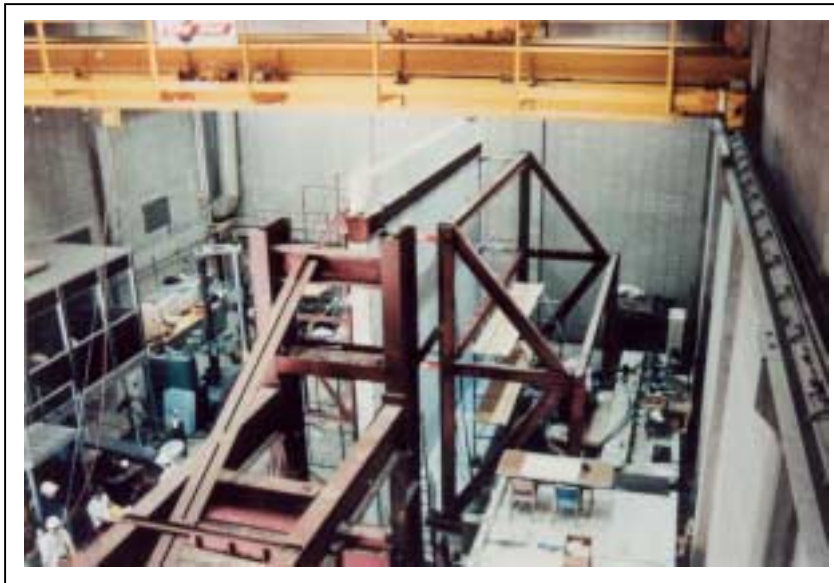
Photograph Showing Large-scale Replica Test Setup
